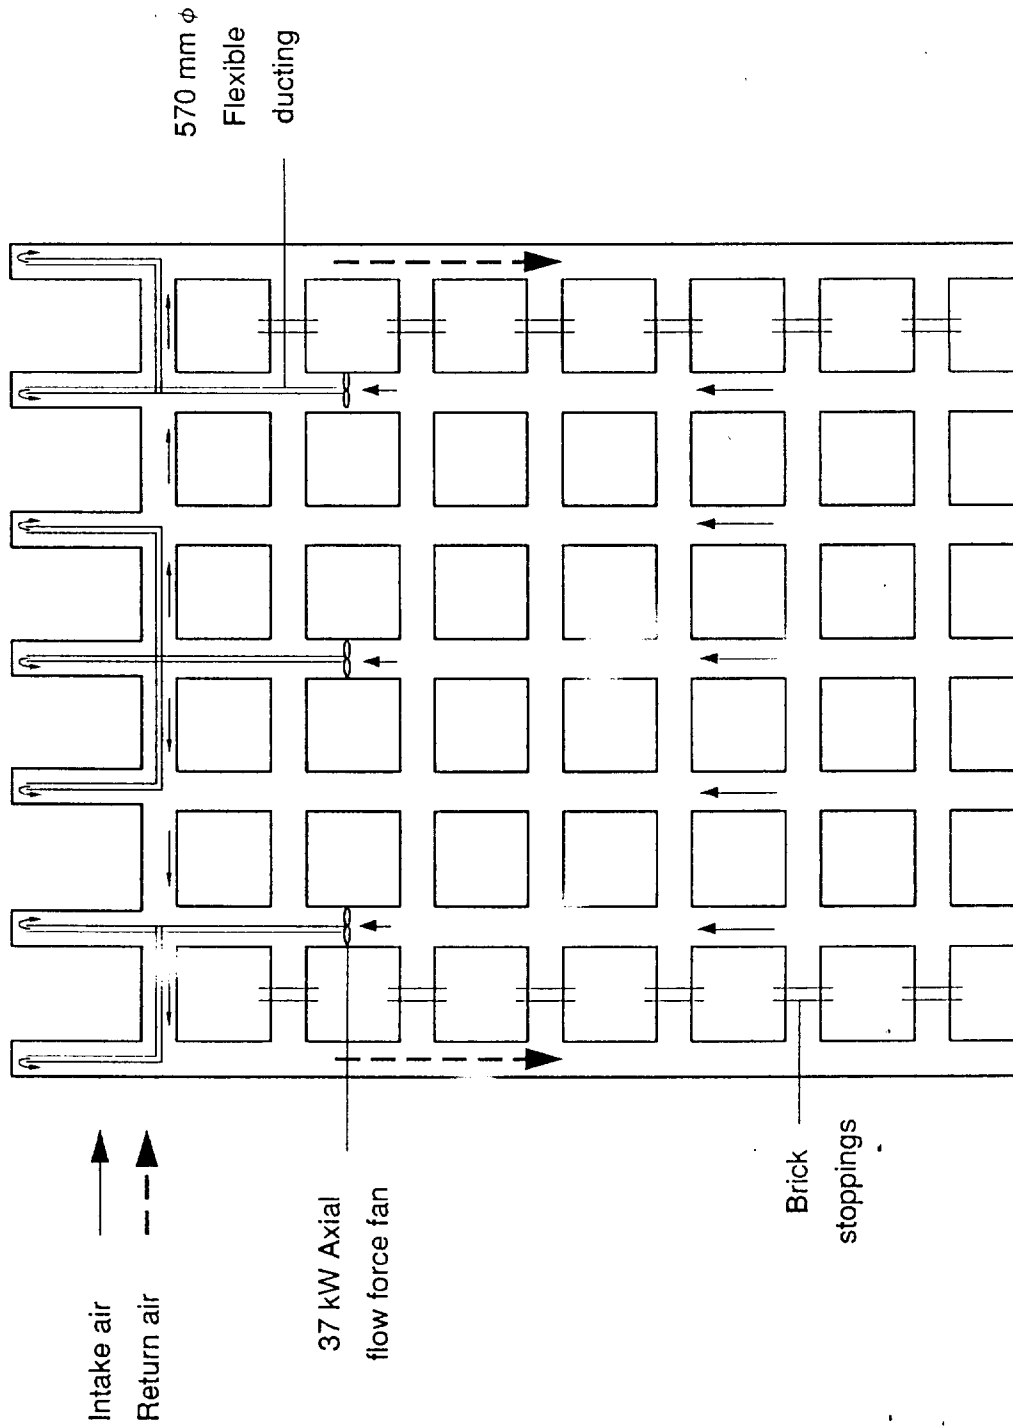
Ventilation layout for bord and pillar development using splitting ventilation.
